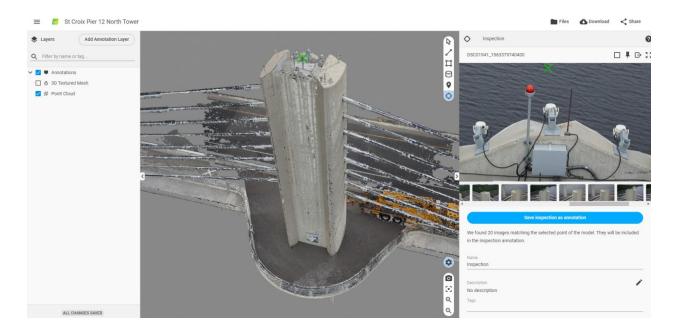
St. Croix Crossing Bridge 3D Photolog
